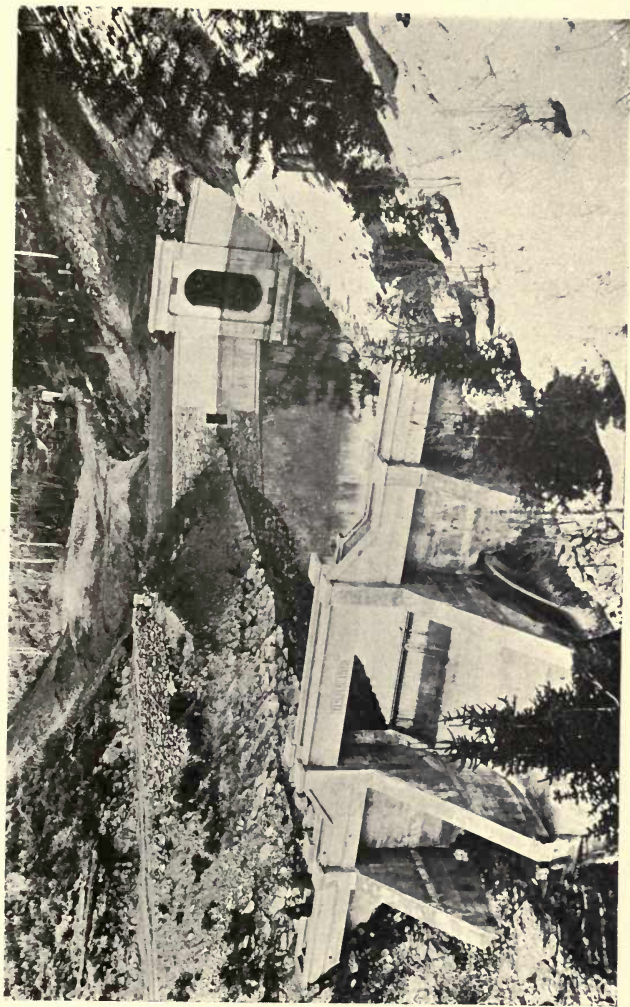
Measuring Weir, and west Portal, Strawberry Tunnel, Utah.
